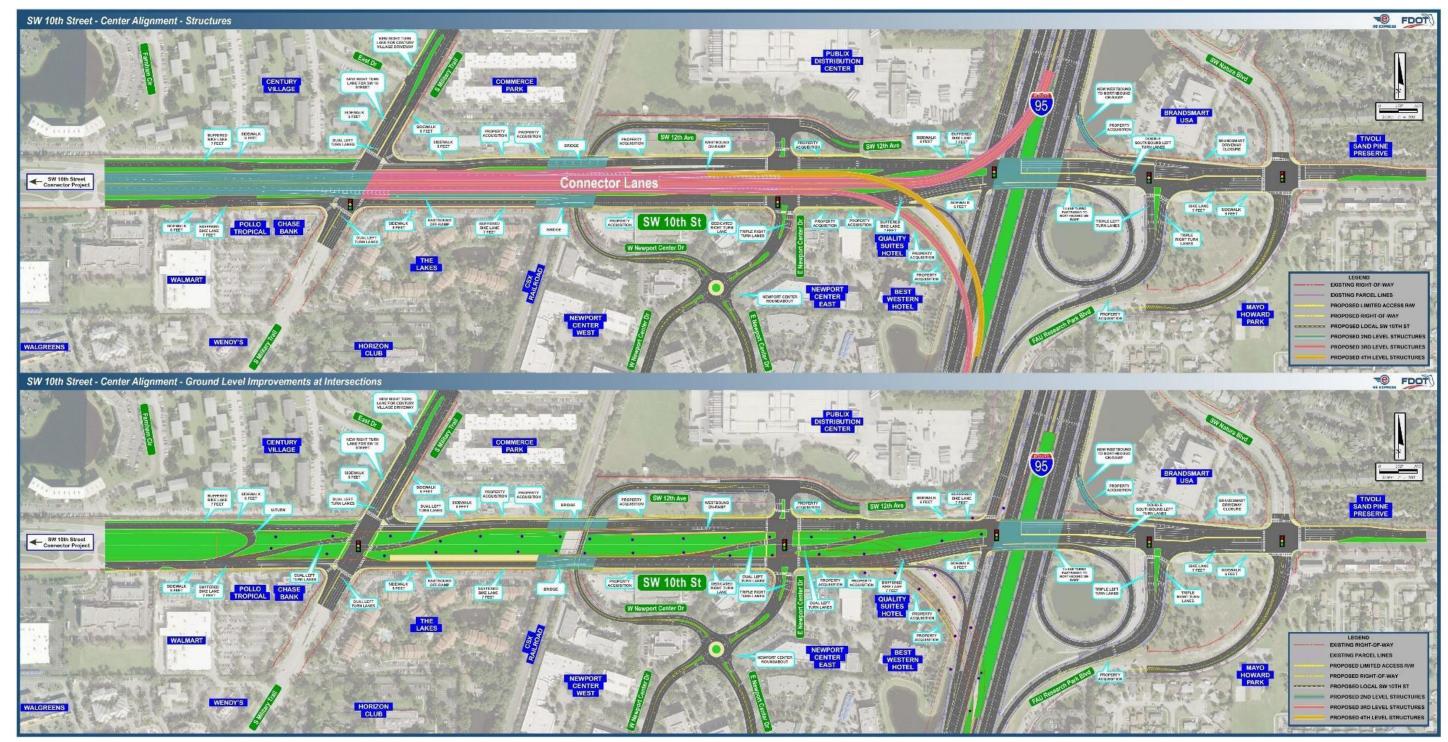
4: SW 10th Street – Center Alignment Concept Plans
